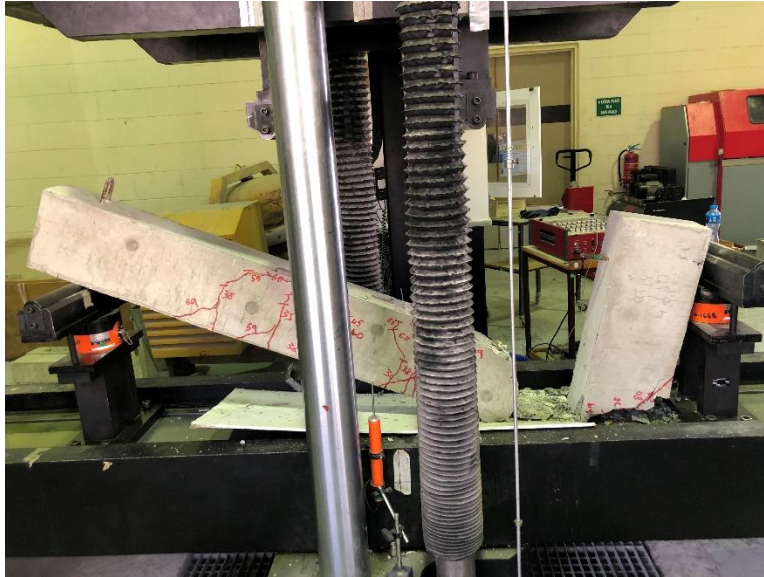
GFRP tensile rupture in Specimen B-F-2.
